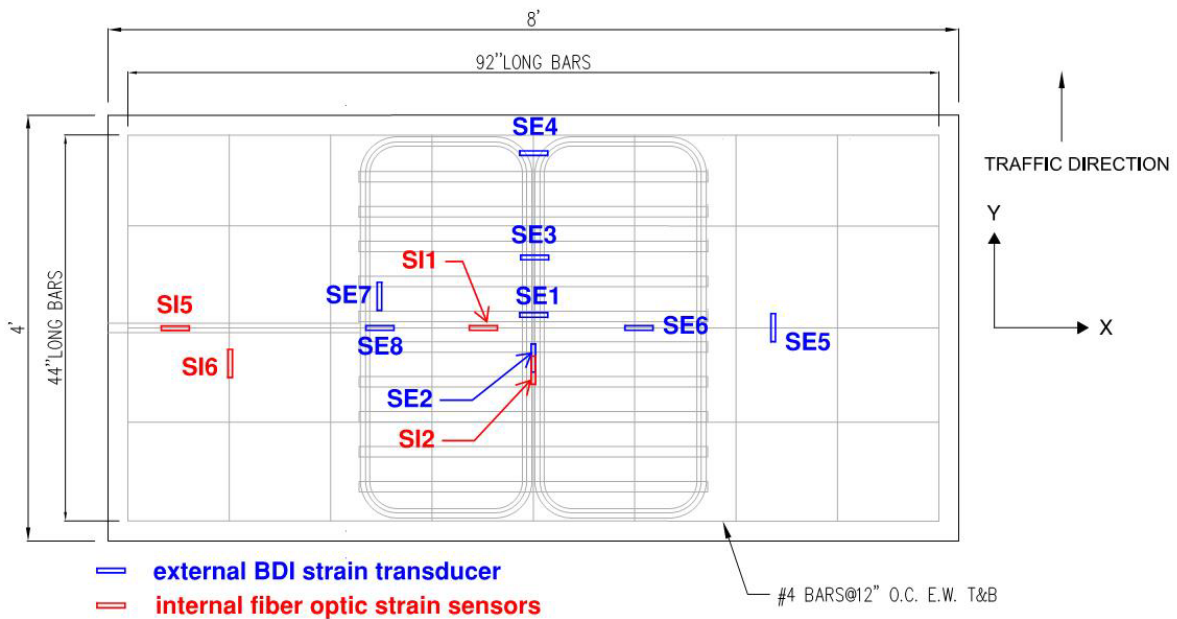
Instrumentation plan for typical panels – top mat of reinforcement, plan view
